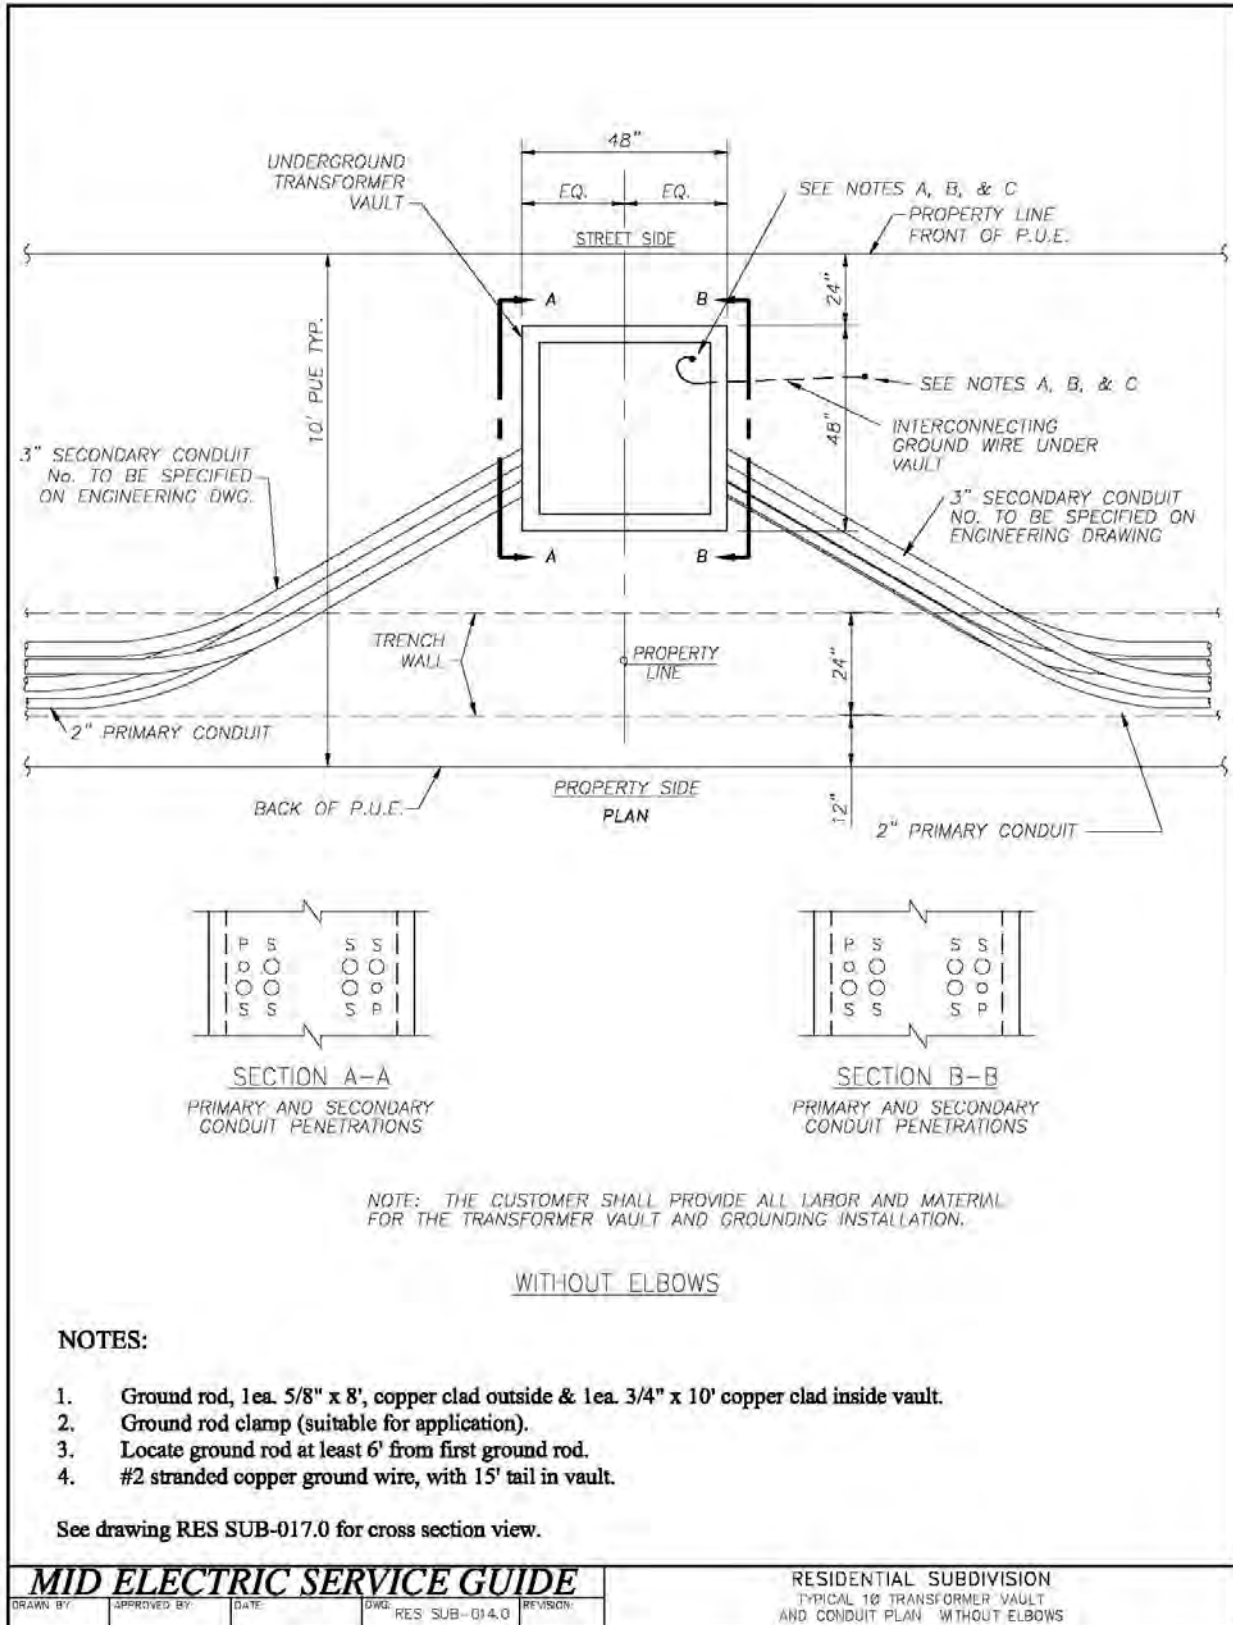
Typical Electrical Distribution Layout Without Elbows
